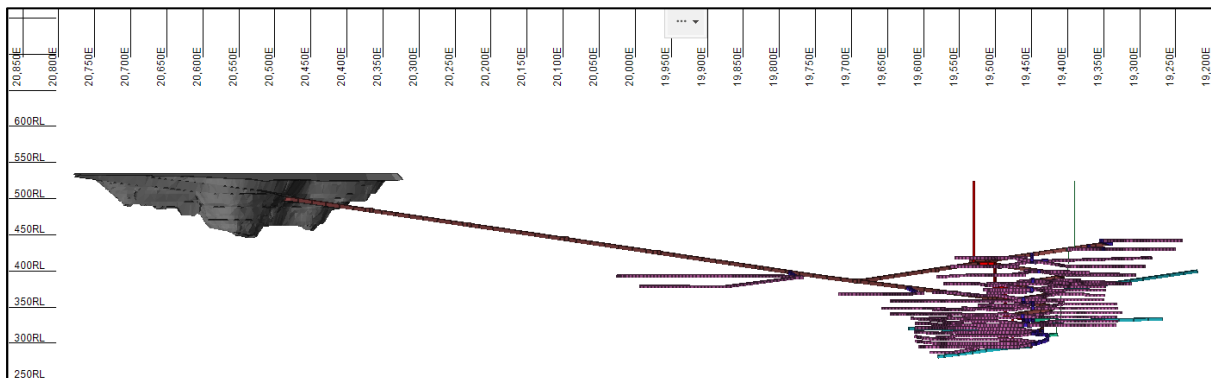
Enlarged Long Section Looking South - Trident Underground Development Layout
